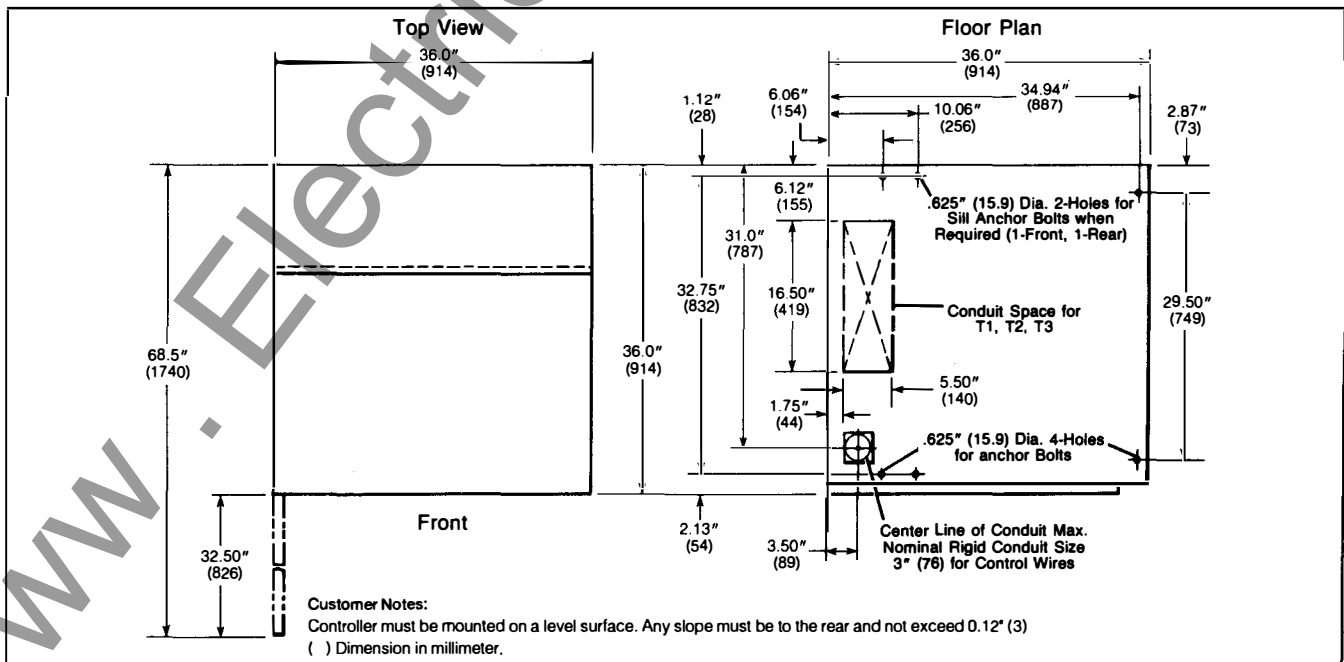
Anchor Bolt and Conduit Entry Locations—Bottom Entry of Load Cables
